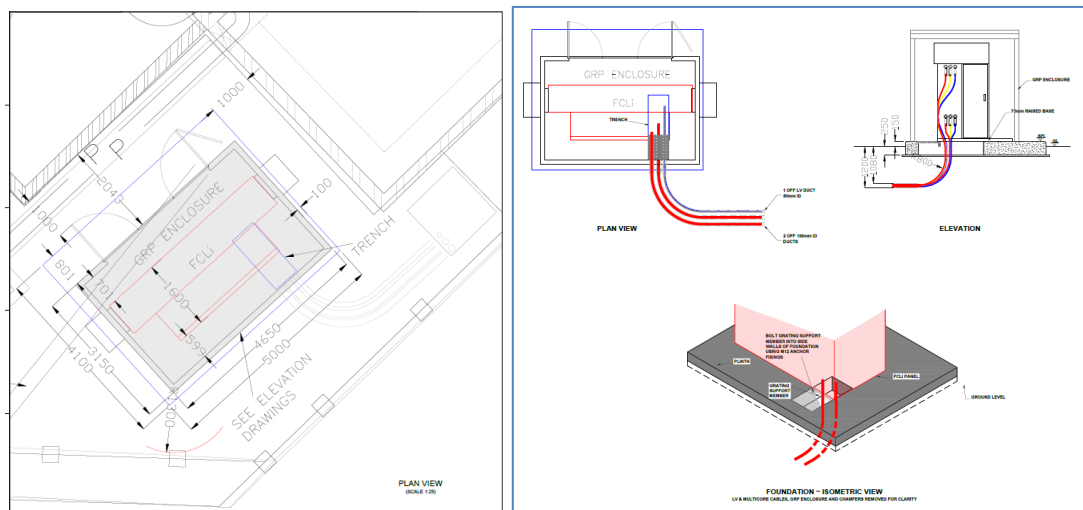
FCLi & GRP Positioning at UoW Primary (left) and Foundation Details (right)
